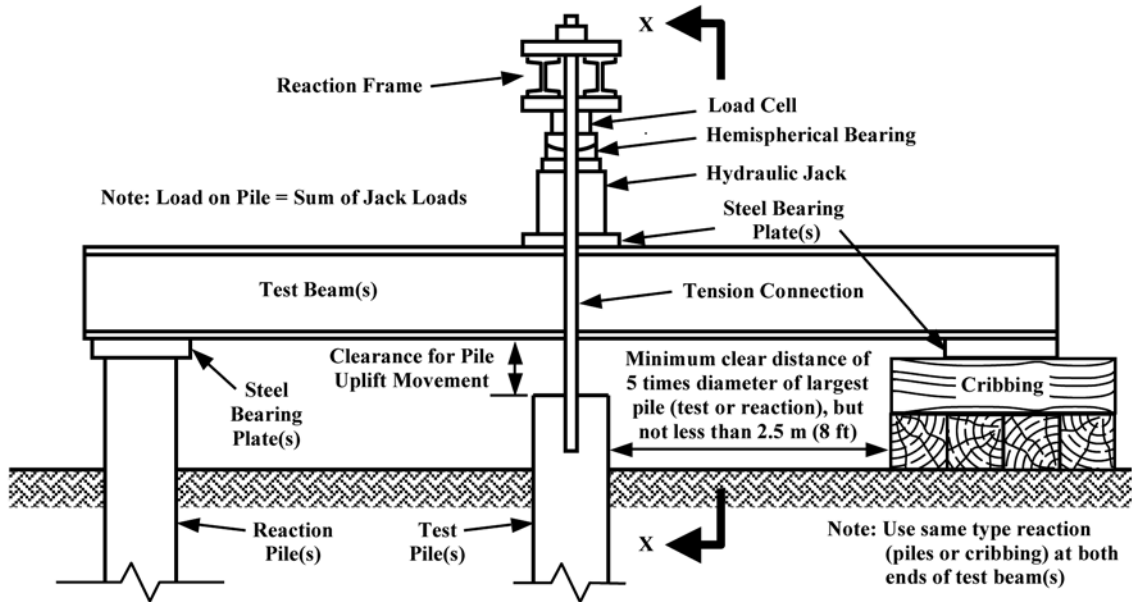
Typical Setup for Tensile Load Test Using Hydraulic Jack(s) Supported on Test Beams
